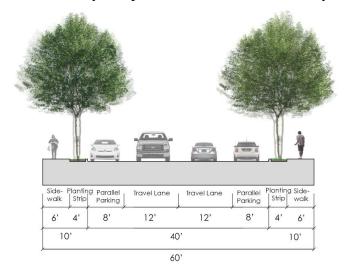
North Pioneer Street section from Lowell Downtown Master Plan.
